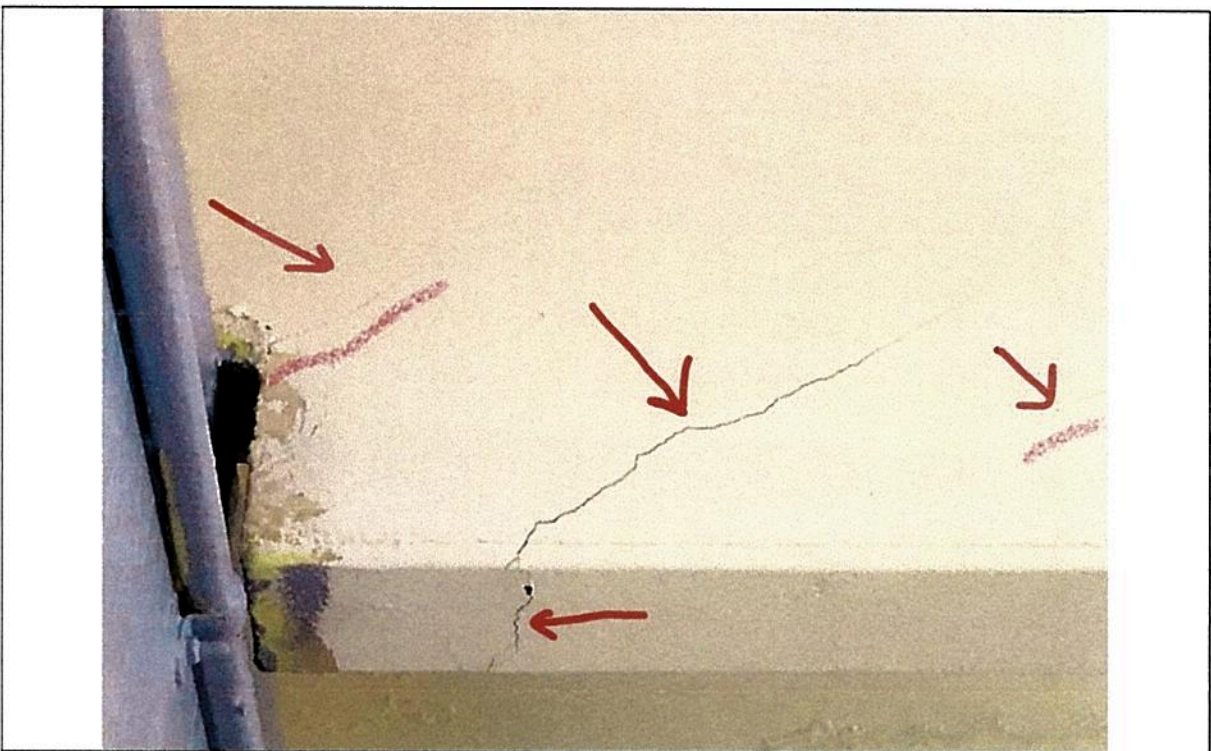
Floor and roof slab cracks at the N-E building module (Classrooms)
